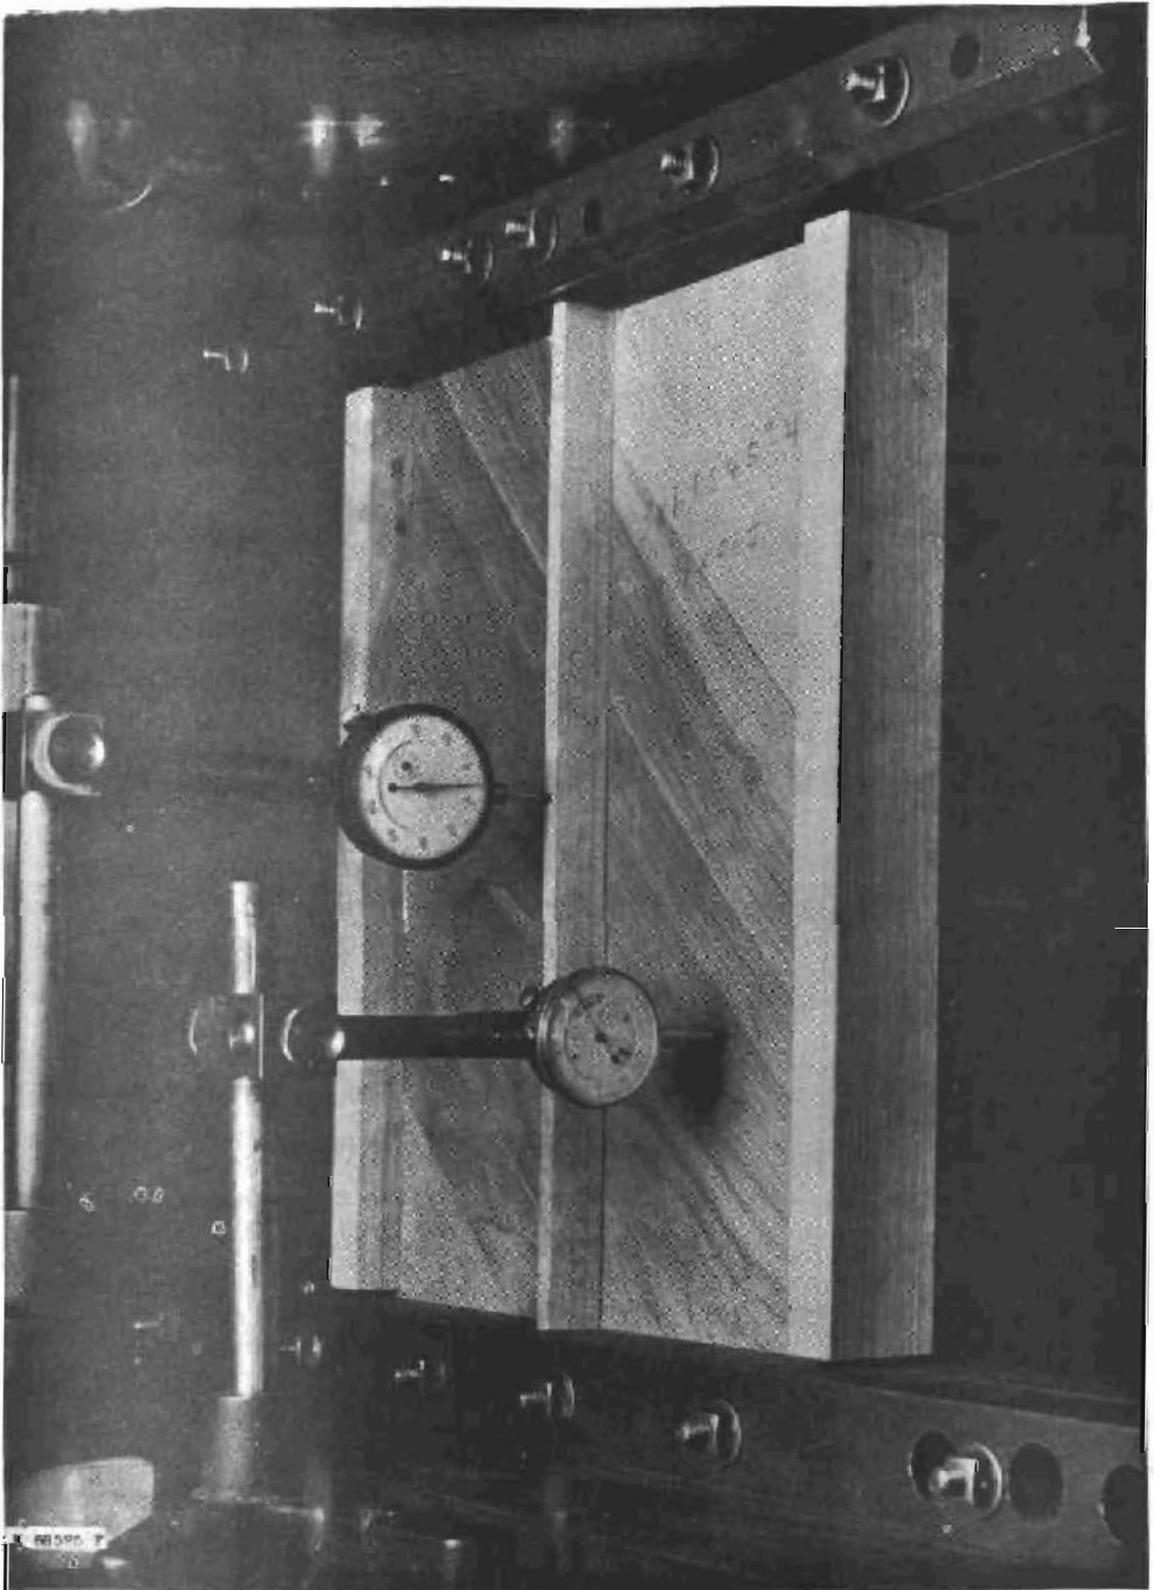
Specimen ready for test. Loaded ends clamped, edges simply supported, and lateral-deflection indicating dials in position.
